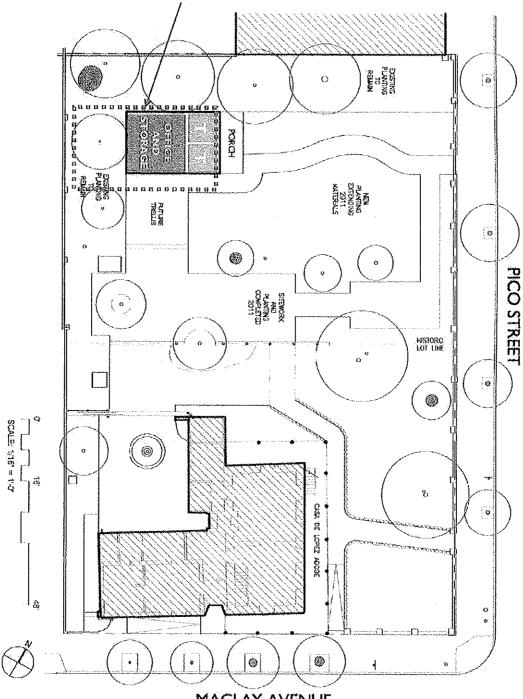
APPROVED SITE PLAN IN THE LOPEZ ADOBE PRESERVATION PLAN
